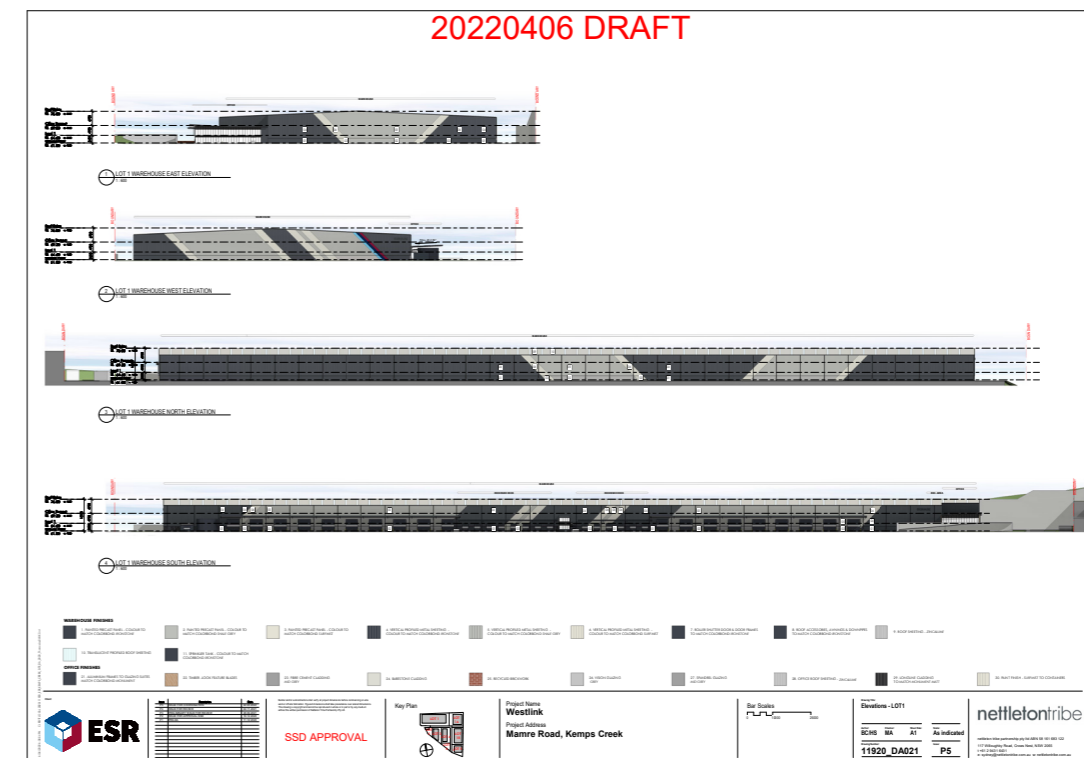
Elevations Lot 1 - (Source: Nettletontribe)
